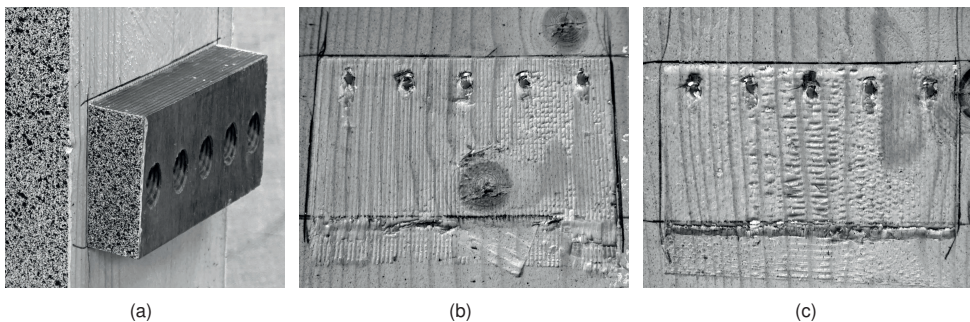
Softwood surface after tests with offset screws: (a) reduced indentation of connector plate; (b) impression of pyramid pattern; (c) impression of circular pattern.
